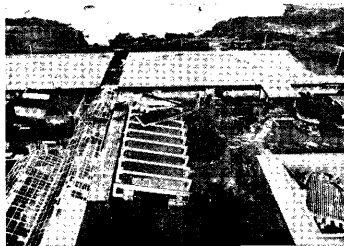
Damage to cement tile roof: steel frame.
